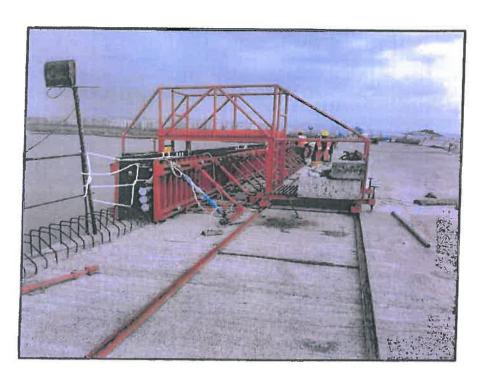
Outer Crash barrier formwork alignment at Span MP 222-223 LHS in progress
